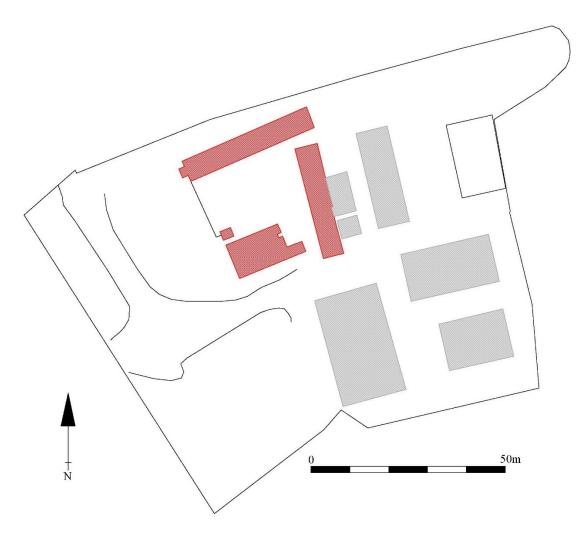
Outline of site buildings Red buildings are the surveyed 19th century structures. Grey buildings are late 20th century steel and concrete structures The farmhouse is the south-western red building
